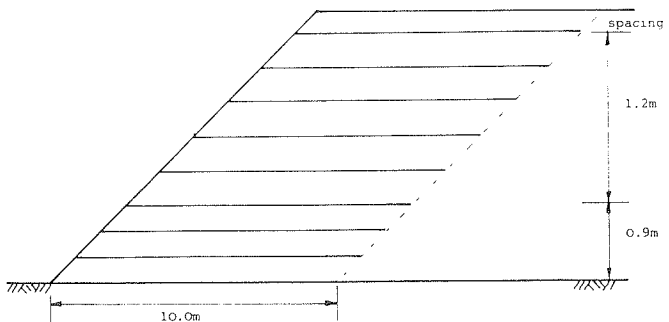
Design chart reinforcement arrangement for slope at Brampton, Ontario.
